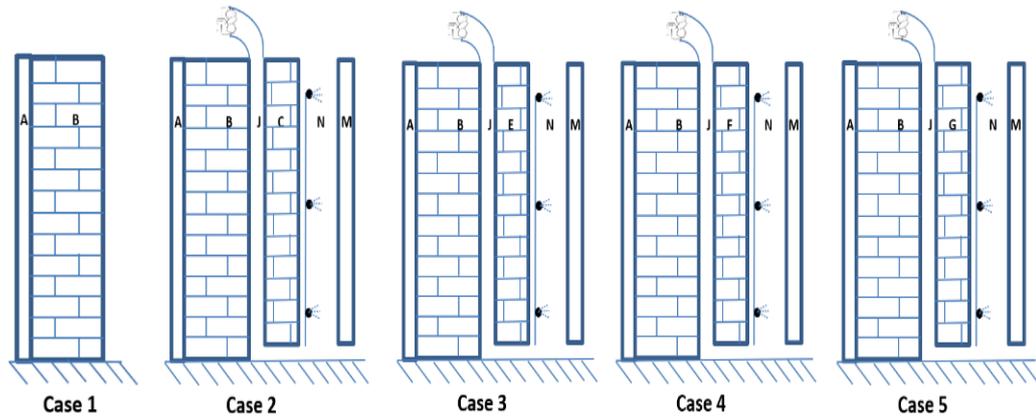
Types of studied walls (A Gypsum 25 mm, B Common rick 240mm, C Face brick 120 mm, E Tile brick 40mm, F Limestone 40mm, G Solid cement brick 40mm, M Window screen / mesh, N External air gab and humidification System, J Ventilation duct 50mm)
